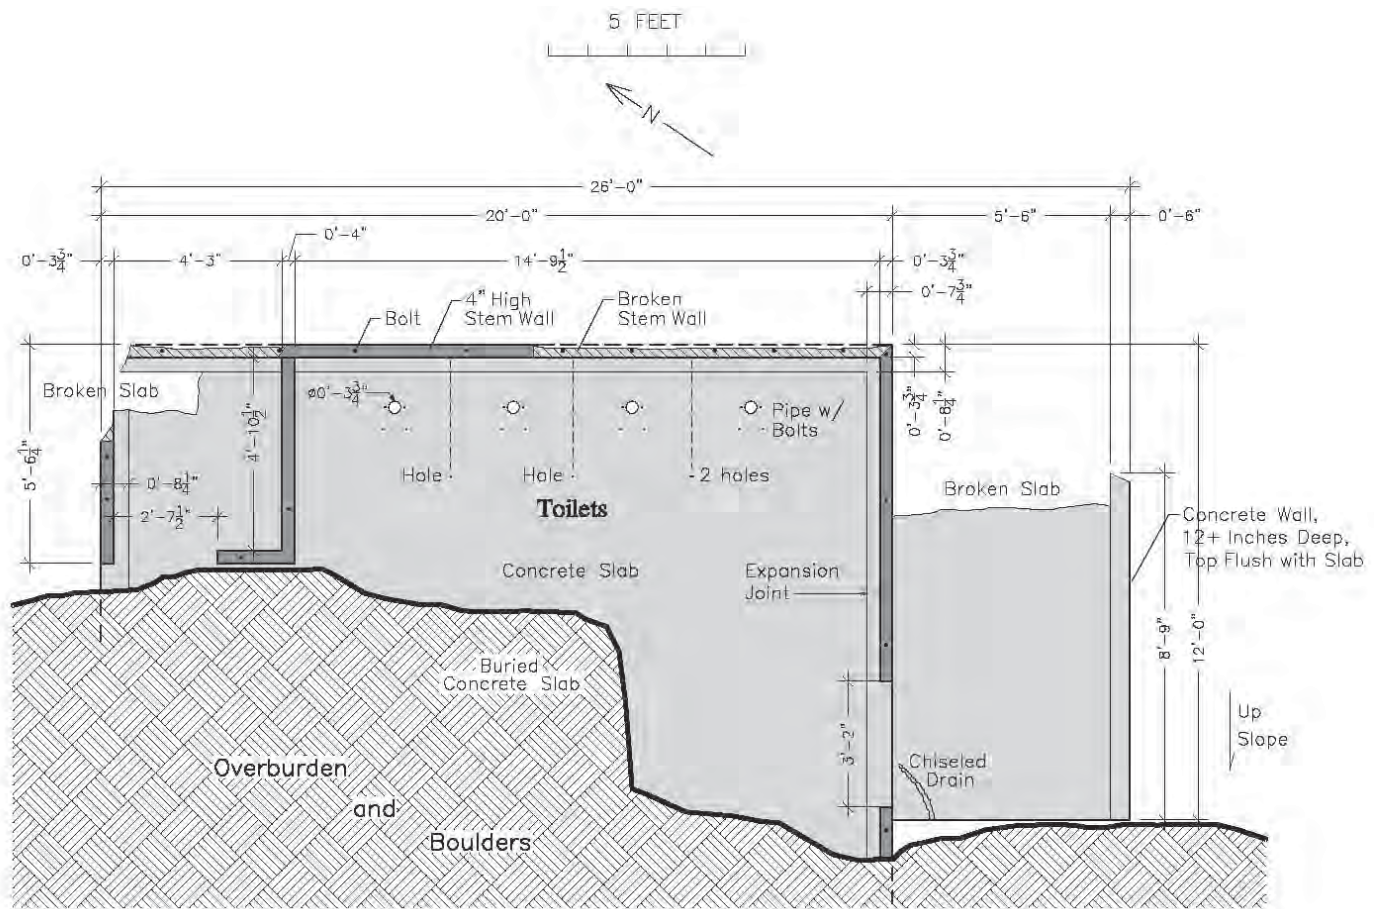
Feature V-7, internee latrine and shower building foundation.
